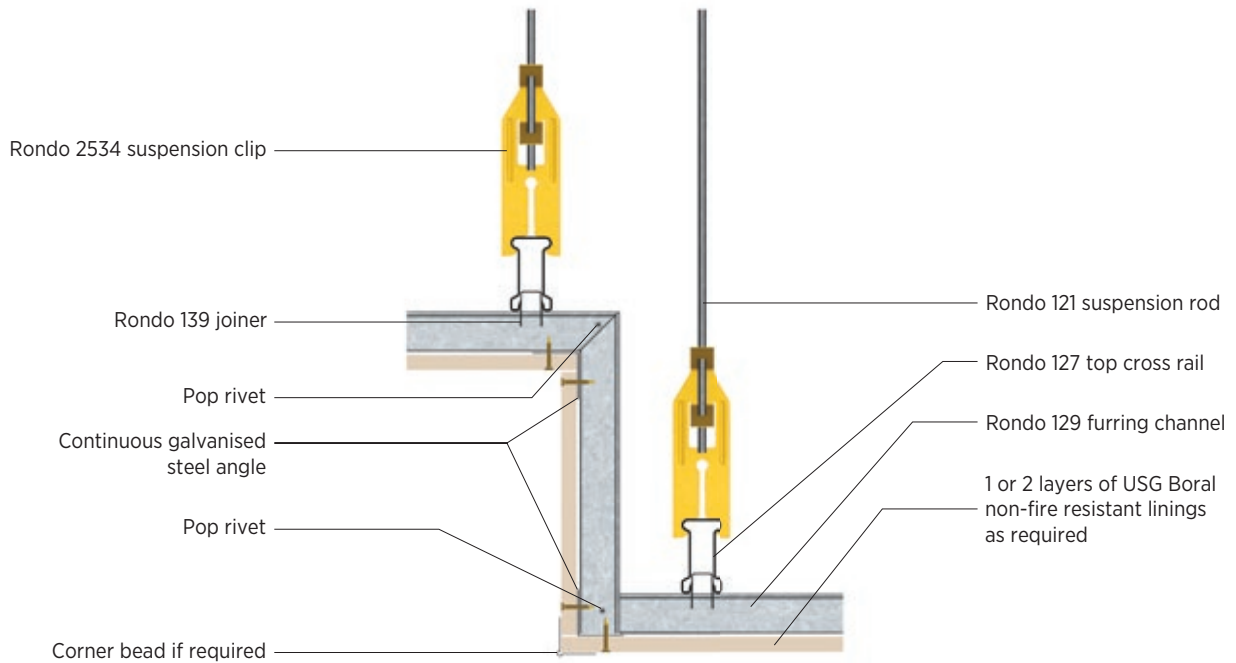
Typical Bulkhead Detail - Section Through Top Cross Rail
